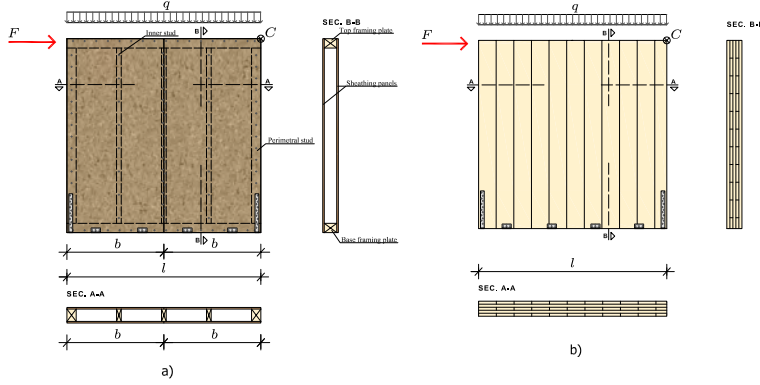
a) TF (timber framed wall) ; b) CLT (Cross laminated timber wall)
